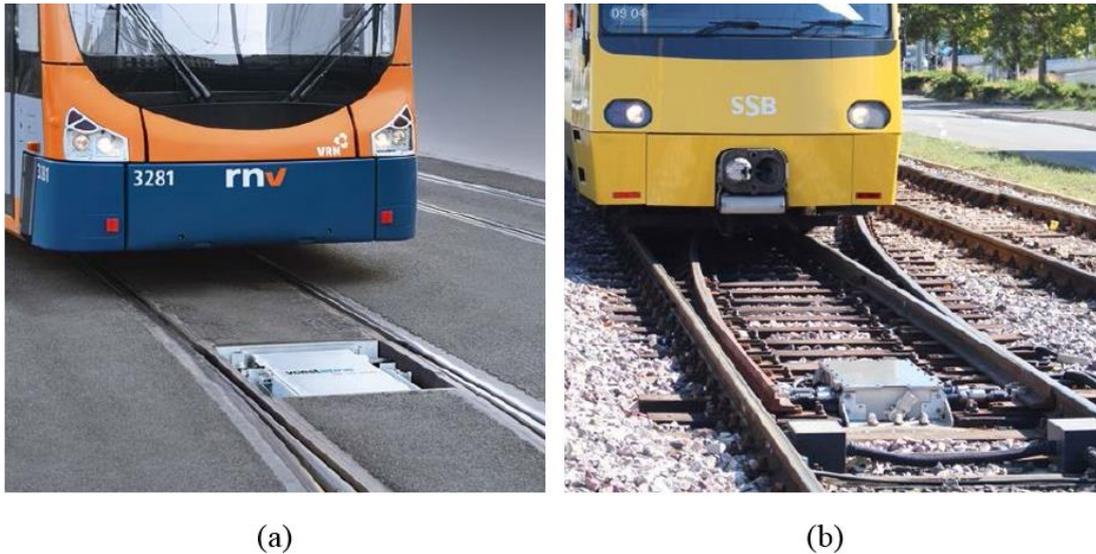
Unistar CSV 24 point machine embedded track, 1000 mm track gauge (a) and open track, 1435 mm track gauge (b) [16]
